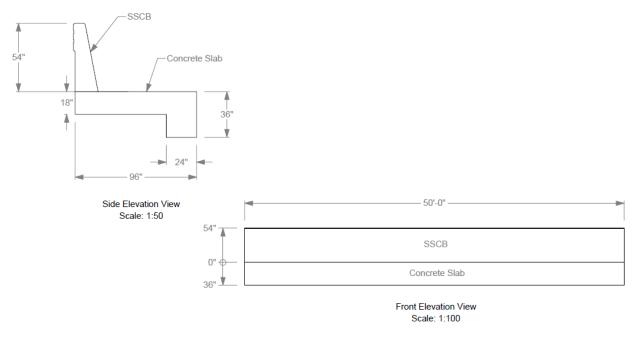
Concept 6 – Moment Slab with Concrete Beam Design.
